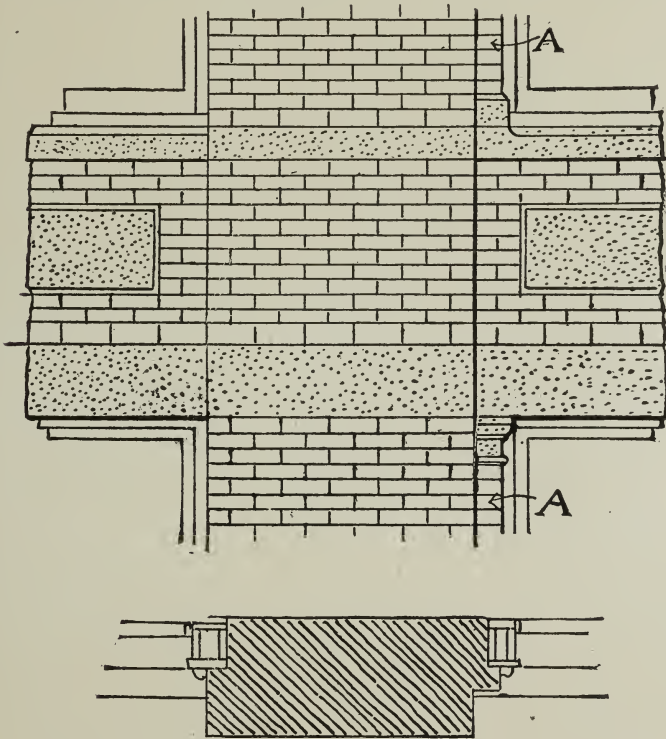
Pilasters Against Pier to Receive Stone Caps and Sills.
